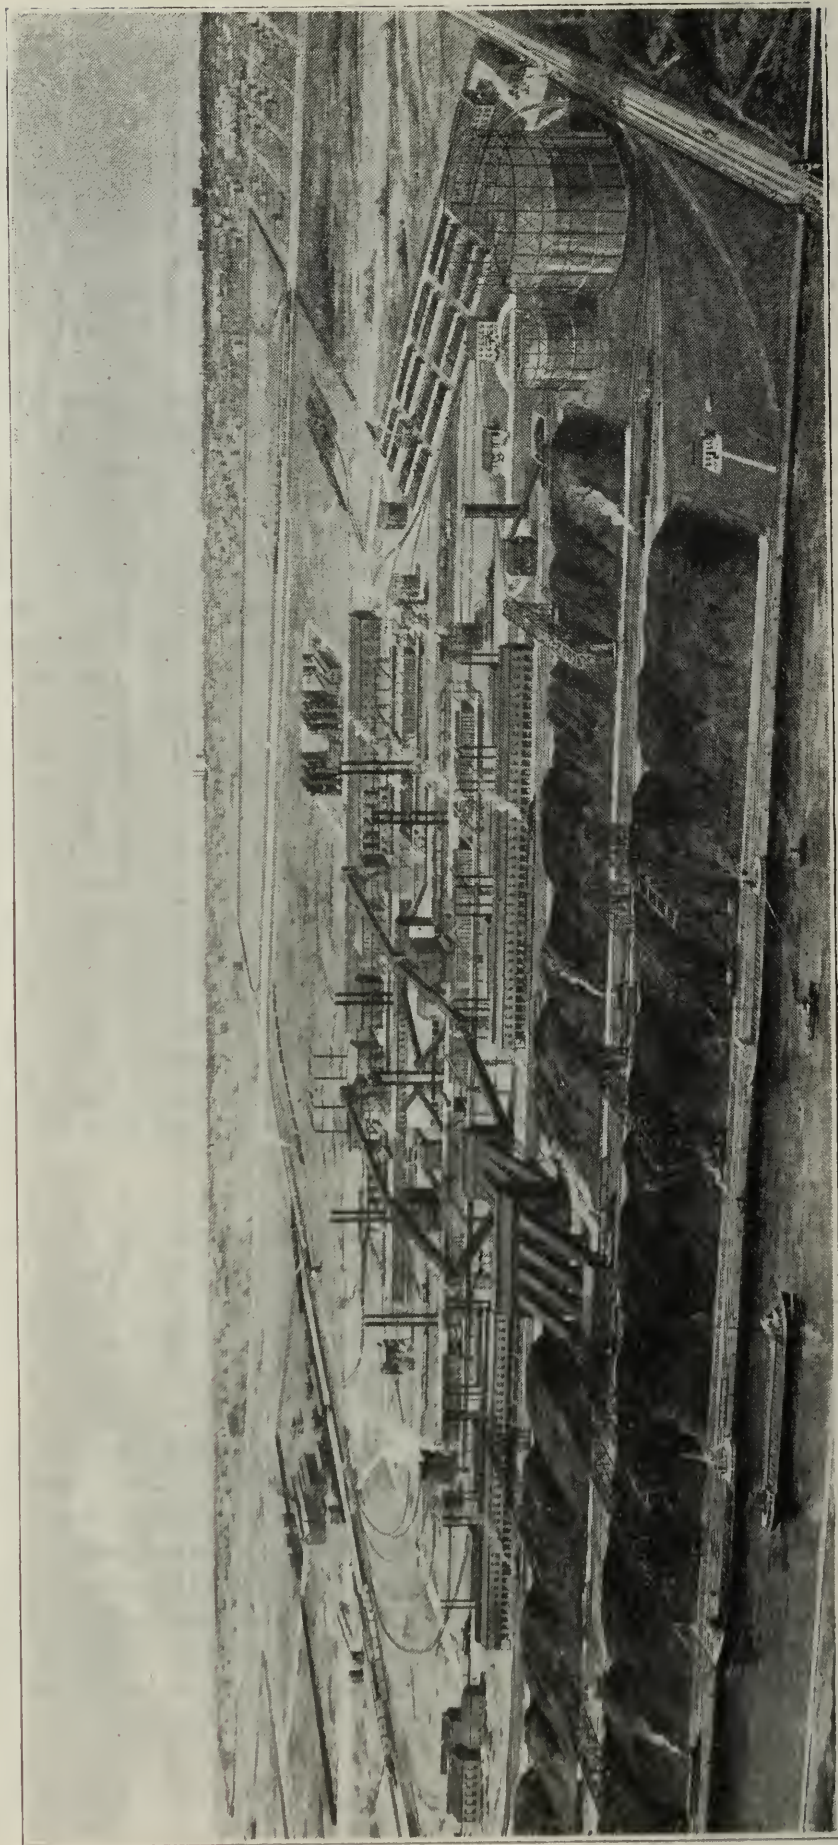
PHOTOGRAPH OF AN OIL PAINTING SHOWING THE PLANT AS IT WILL APPEAR WHEN COMPLETED IN ACCORDANCE WITH PRESENT DESIGNS. THIS SHOWS COAL BEING RECEIVED BY LAKE STEAMER.
